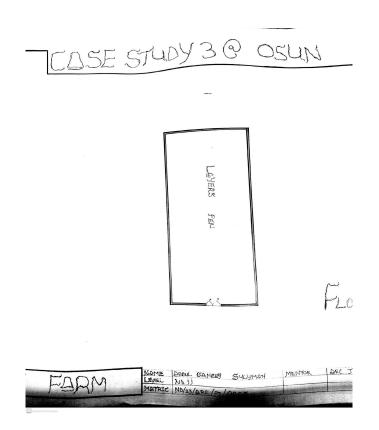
SHOWING THE FLOOR PLAN OF CASE STUDY THREE
